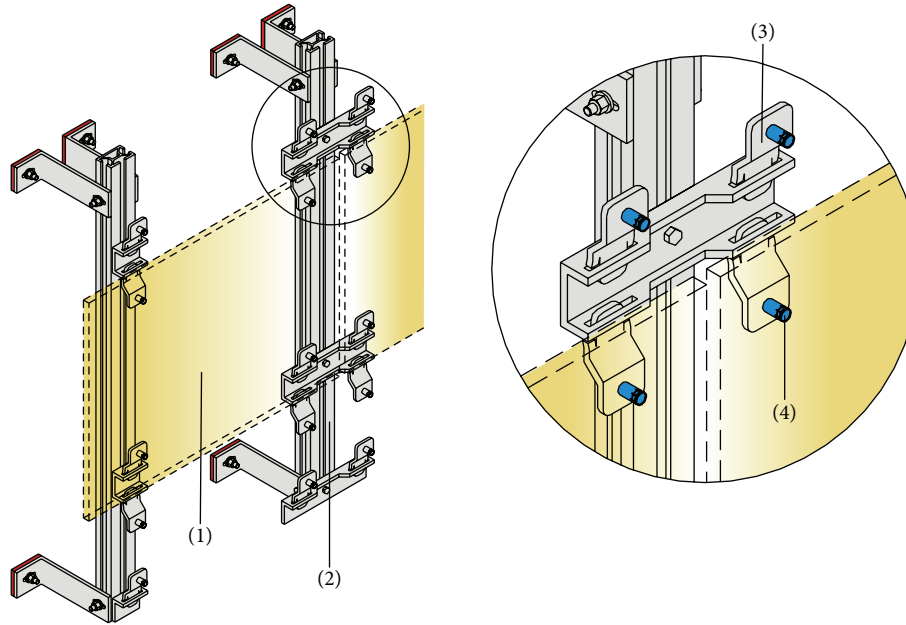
Example of understructure for fixing ventilated facade claddings. Designations: (1) facade panel, (2) steel-aluminum understructure, (3) holder fixing the facade panel, and (4) undercut fixing.
